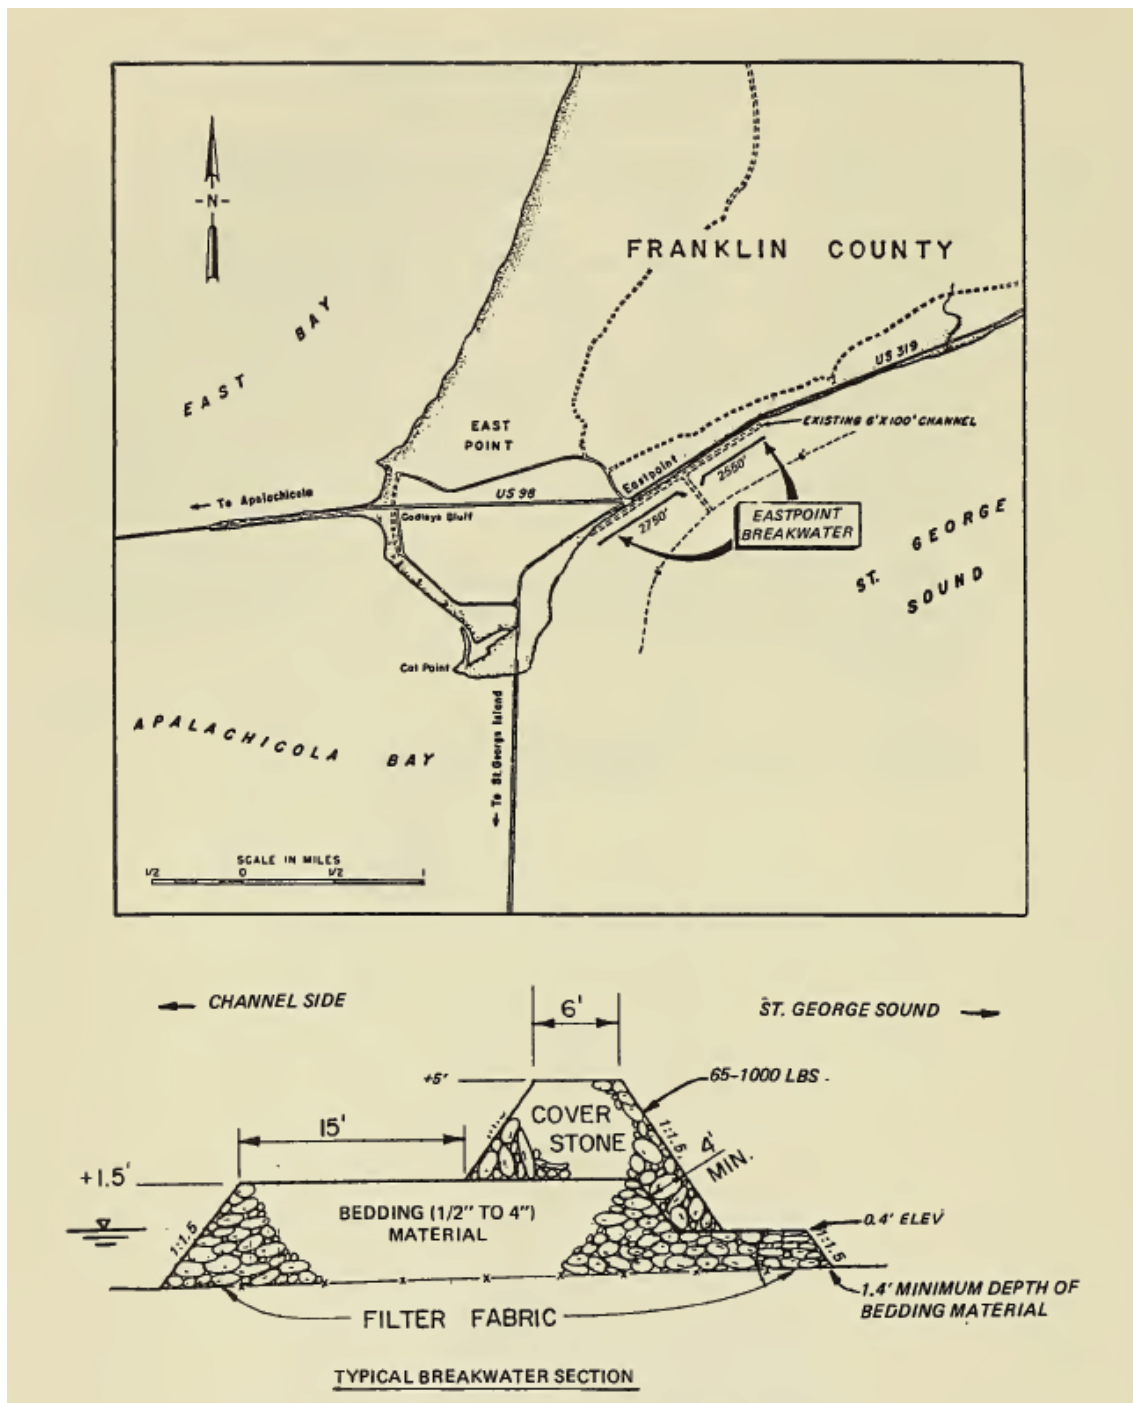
Eastpoint Site Layout and Typical Breakwater Section
